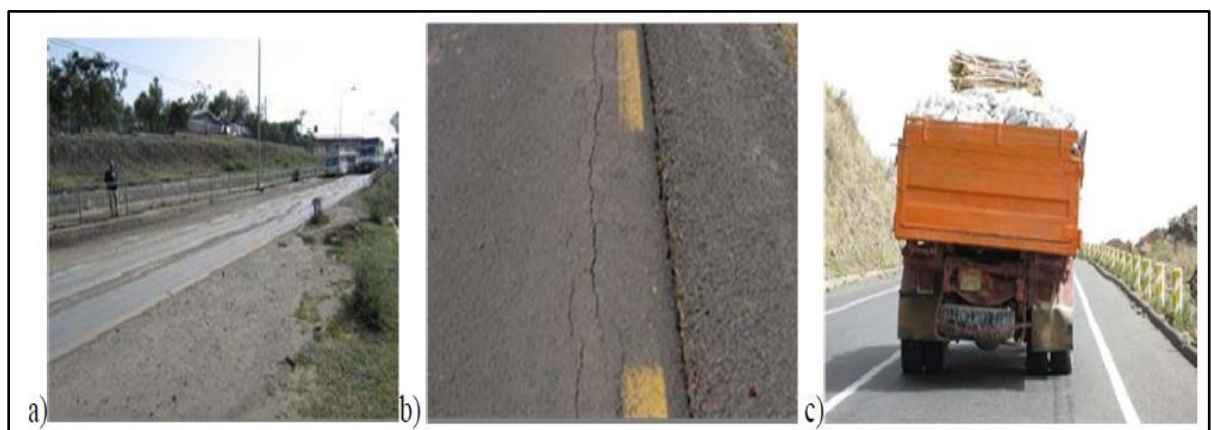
(a) urban trunk road under the influence of expansive soil, Rutting occurred on the surface. (b) Rural trunk road-Vertical rutting of the pavement edge. (c) Heavy vehicles hauling lime-stone have been passing in Abay. Traveling speed is lower than walking
